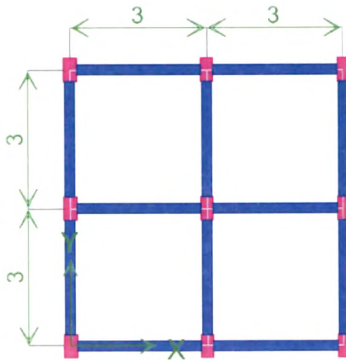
Plan View Showing Orientation of Rectangular Columns
